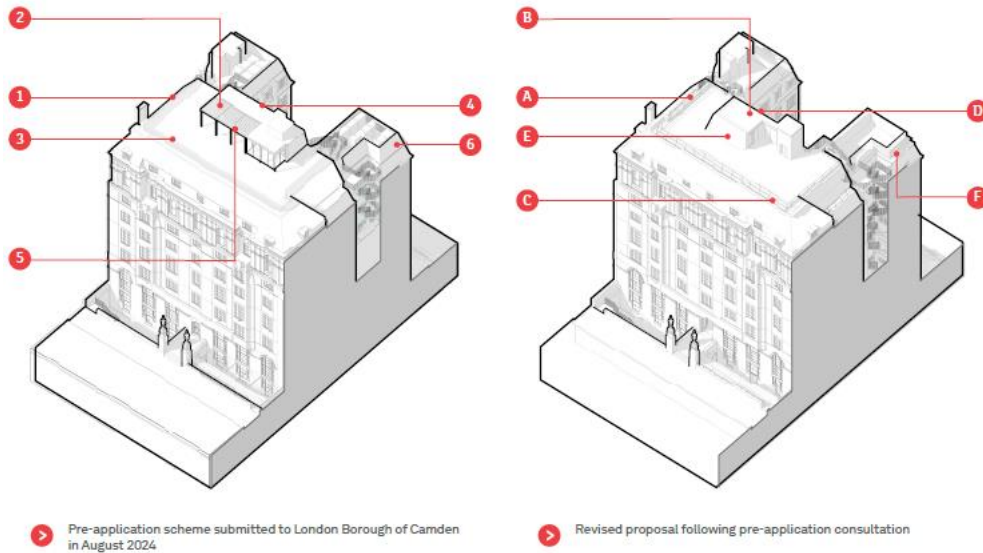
Summary of scheme amendments following pre-application feedback (Source: Orms Design and Access Statement November 2024)
